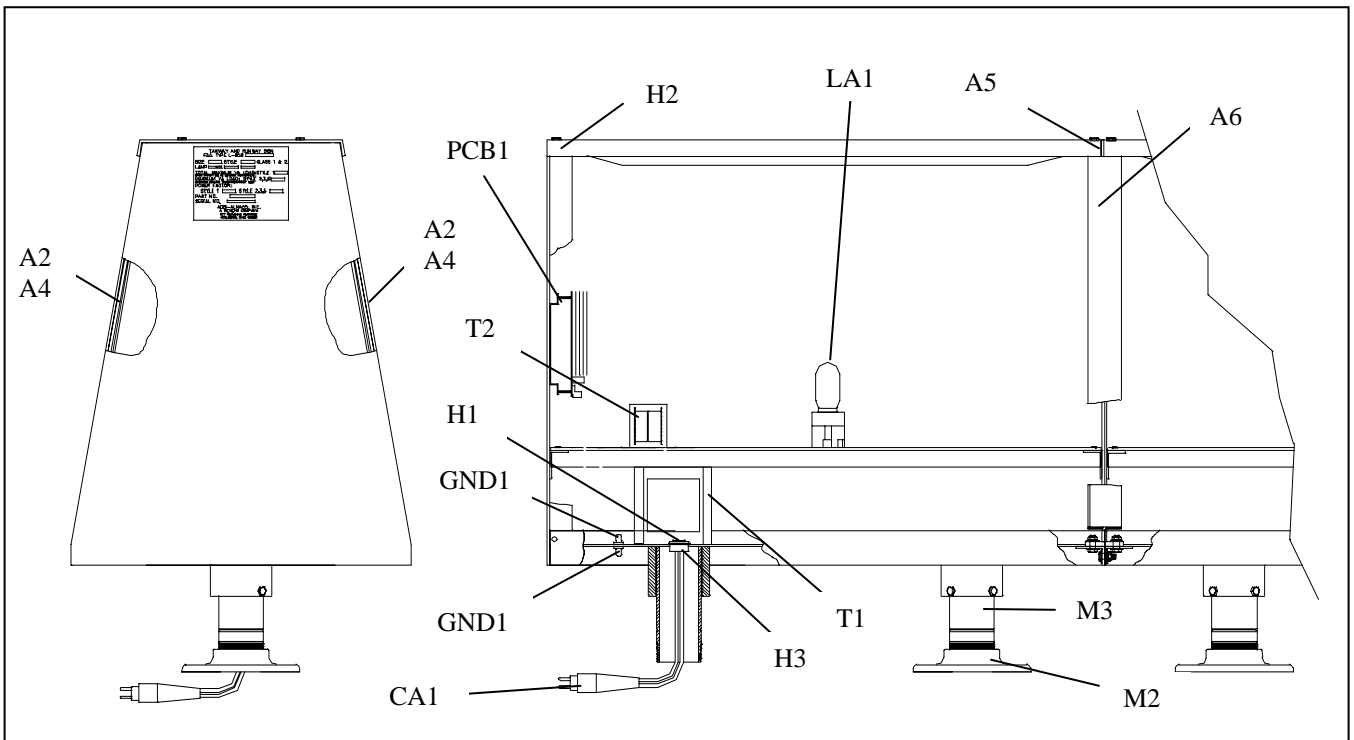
Cross-Sectional View of Low VA Sign Module Assembly (Sizes 1, 2, 3, Multiple Modules)
